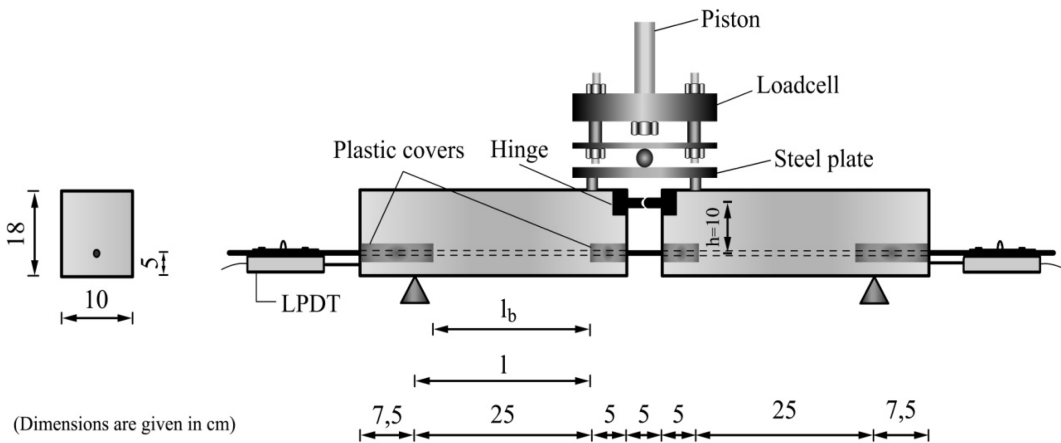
Test set-up of standard Belgium hinged beam test and dimensions of specimens
